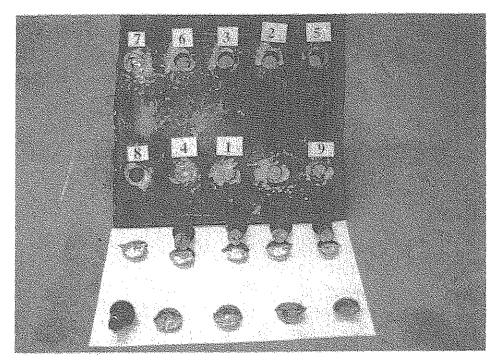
Removed Rivet Shafts and Rivet Heads Next to the Clean Hole
